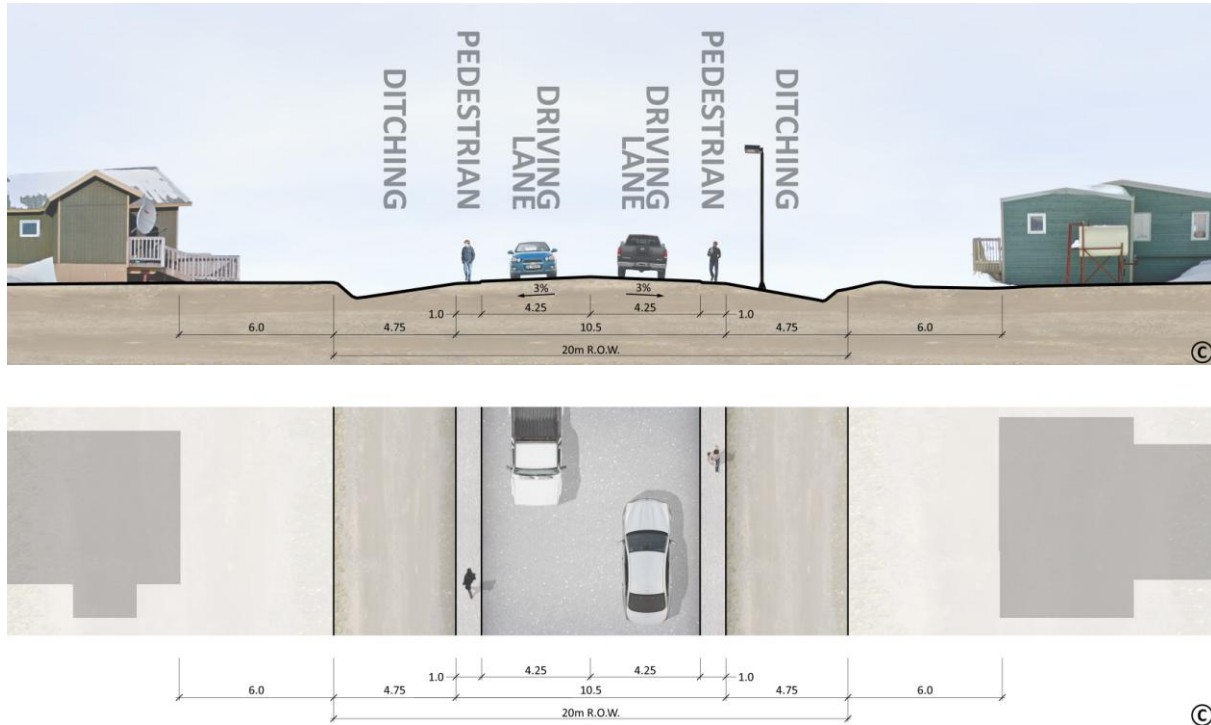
& 2: Cross-sections for Road To Nowhere (Collector Road)
